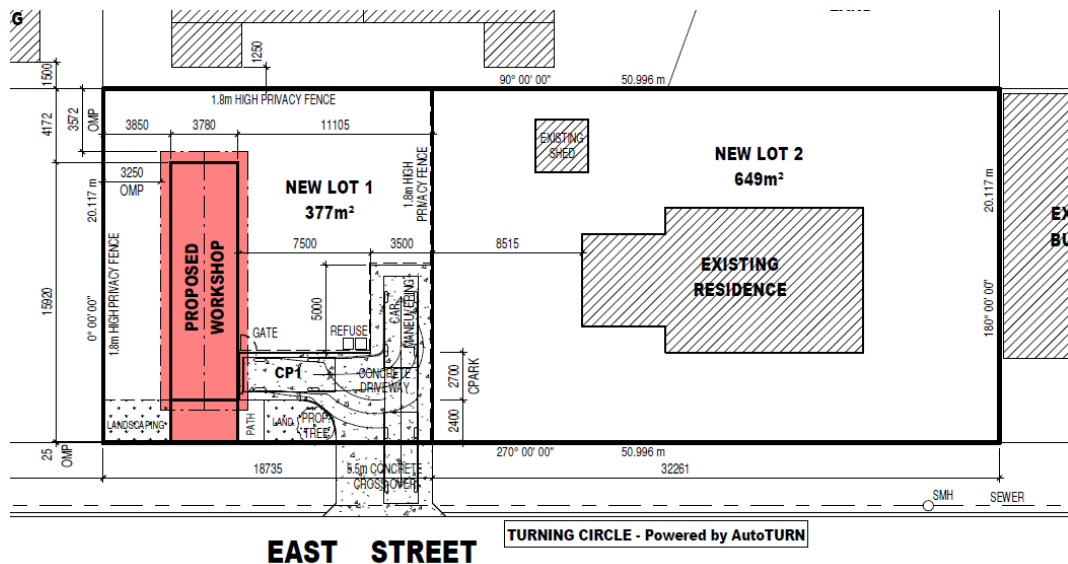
Site plan for construction of showcase study homeworkhouse, “12 Blues Bar” at 88 East Street, Clifton
